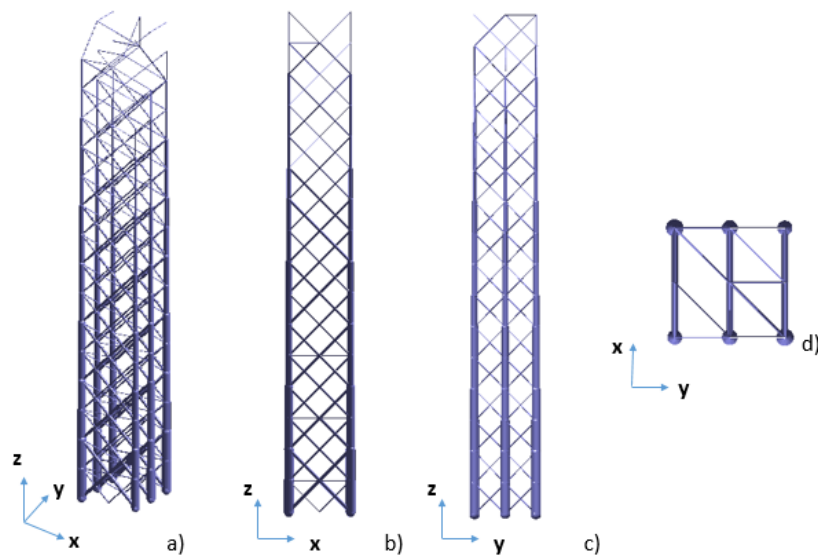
Solutions using the ground structure method: a) 3D view for variable Load Lvl 1; b) Plan X-Z; c) Plan Y-Z; d) Plan X-Y
